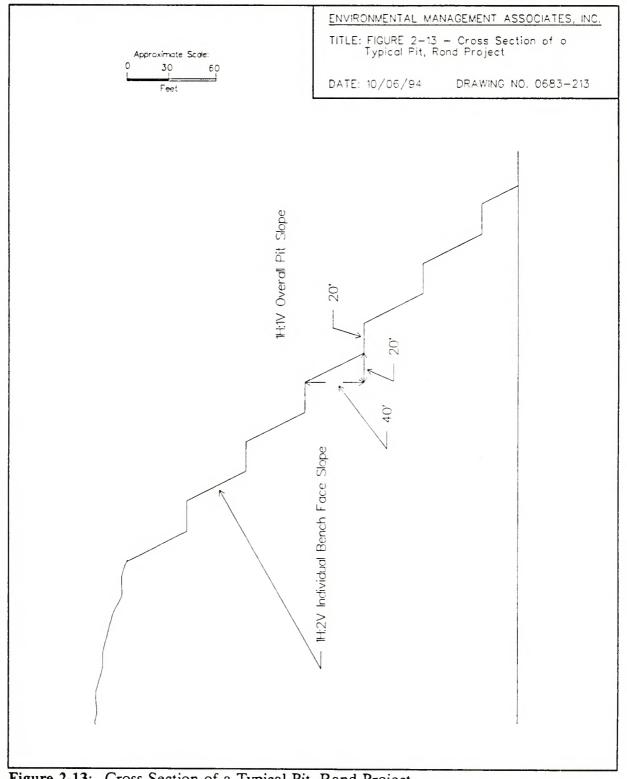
Cross Section of a Typical Pit, Rand Project
